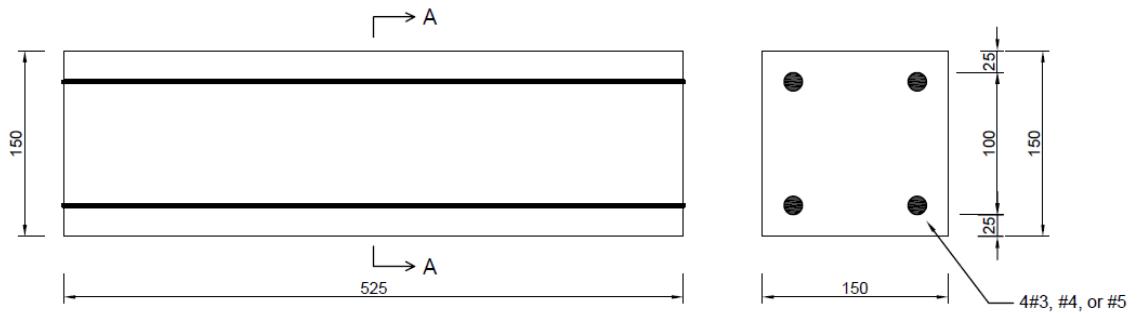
Dimensions and reinforcement configuration of the reinforced concrete prisms (unit: mm).
